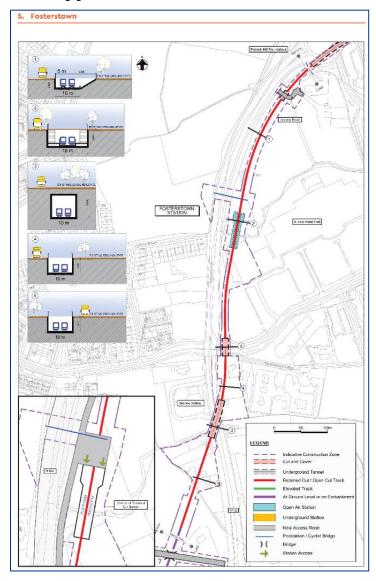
Fosterstown Station and MetroLink Alignment (ref: April 2019 Public Consultation Document)
